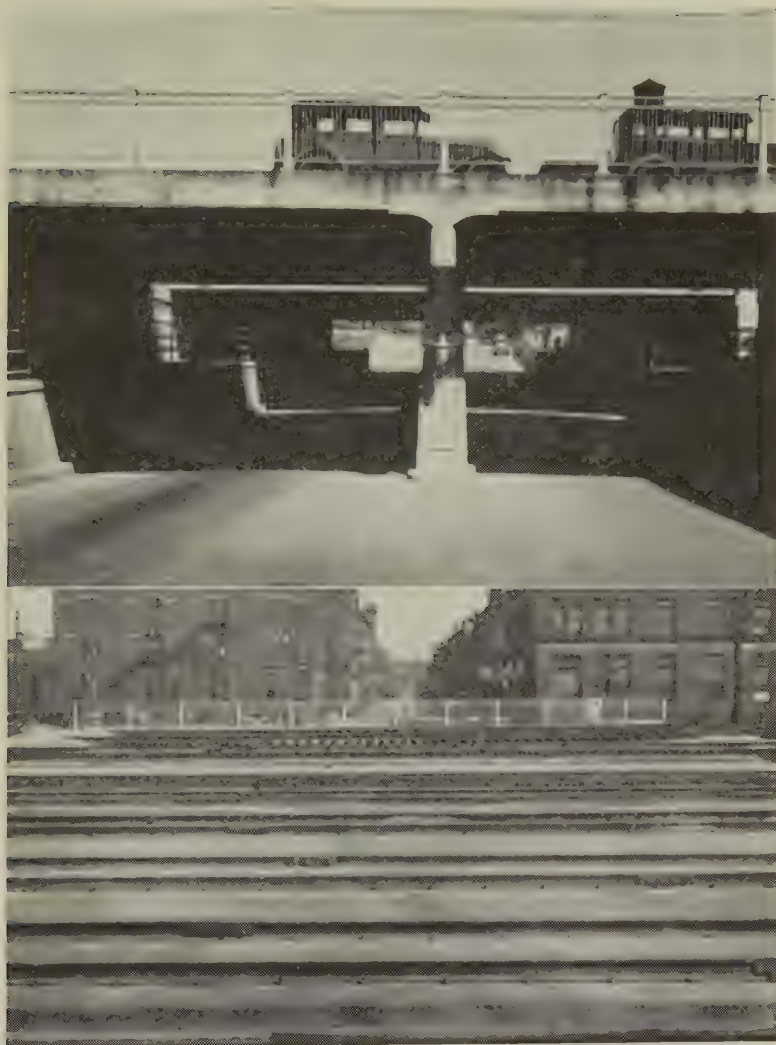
AND 4—RICHMOND ST. SUBWAY, LONDON, ONT. CONTINUOUS OVER CENTER SUPPORT, CAST IN PLACE. NO BALLAST, BUT WITH CONCRETE EMBEDDED CONCRETE TIES. TWO BRIDGES—ONE FOR STREET TRAFFIC, ONE FOR 13 RAILWAY TRACKS
